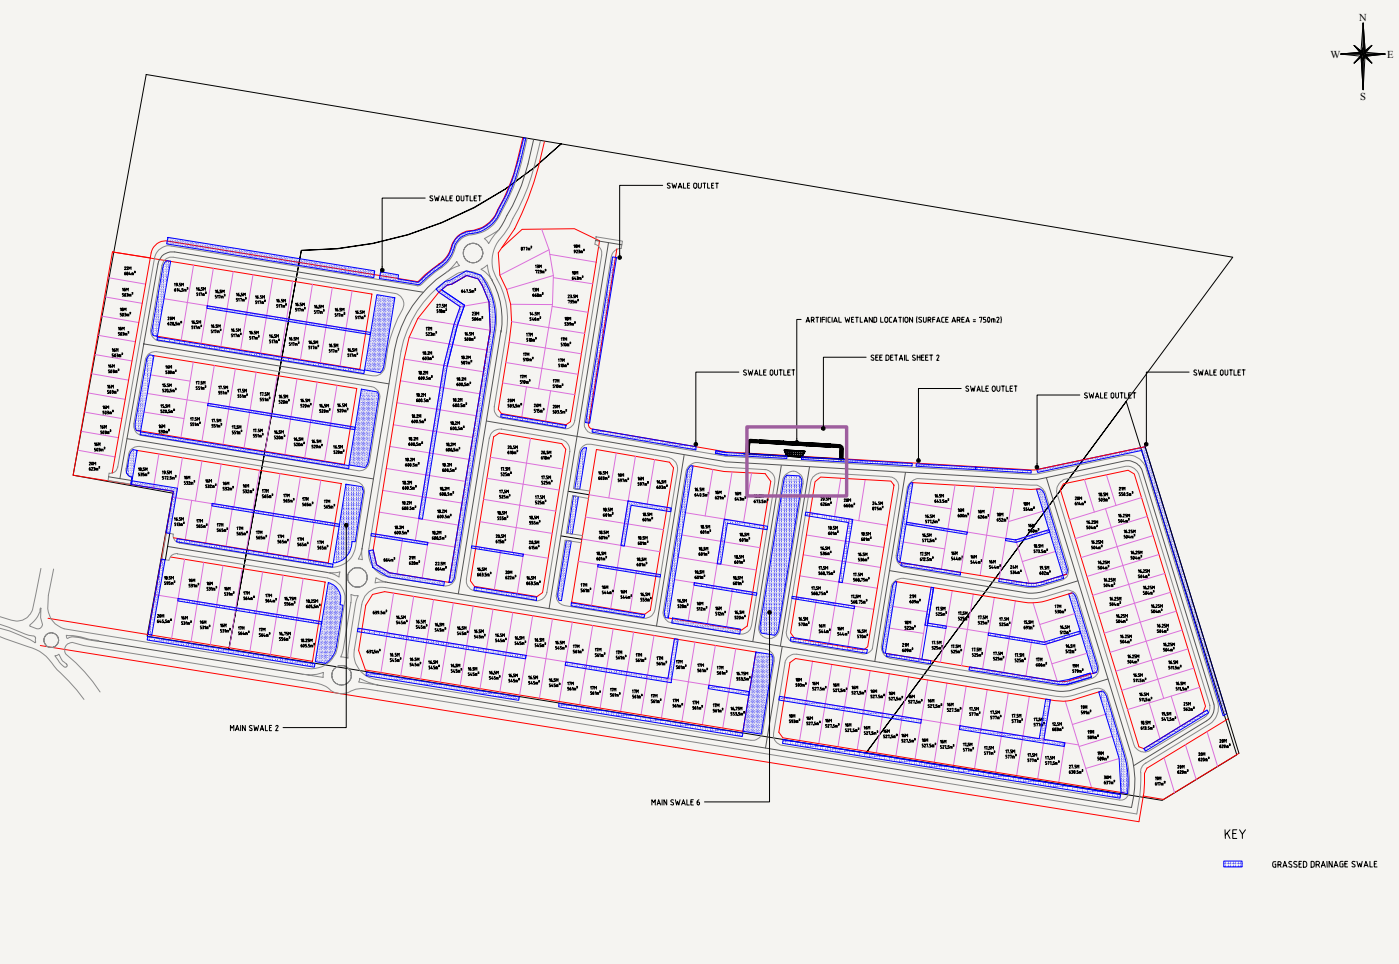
PROPOSED STORMWATER DRAINAGE MANAGEMENT SYSTEM (SOURCE: MARTENS 2009)
